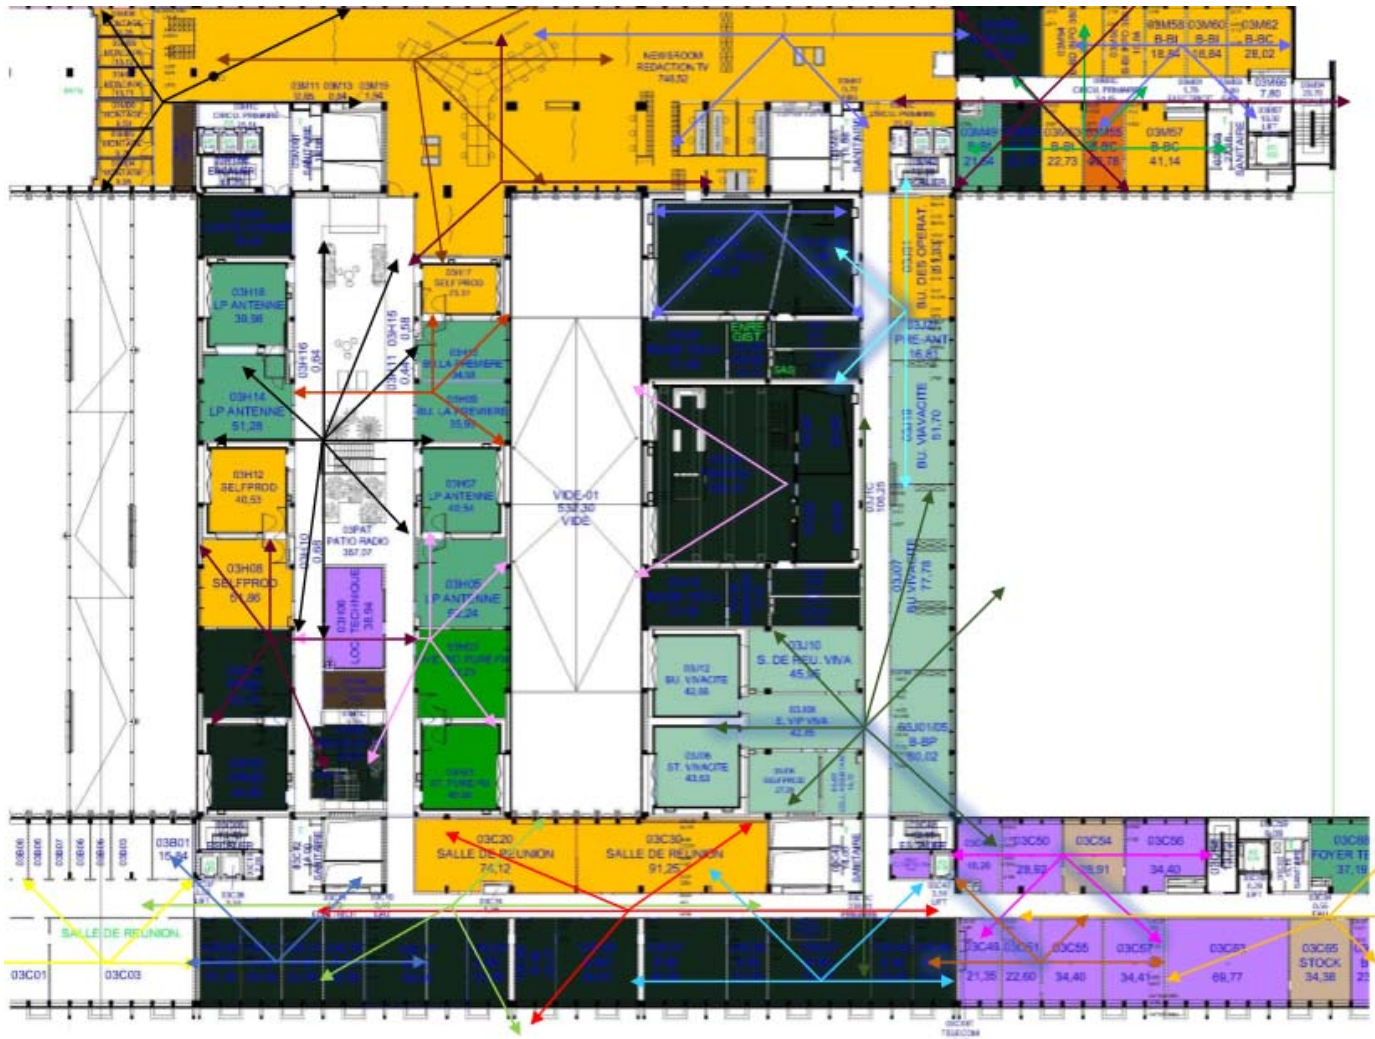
Design at 2.4 GHz for Floor 3 in Building PUVQ
